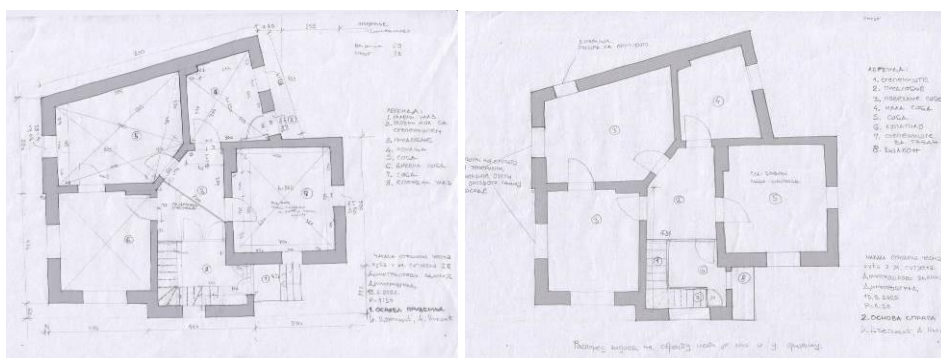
Ground floor and first floor layouts, drawings I. Cvetković, 2020. [2]
